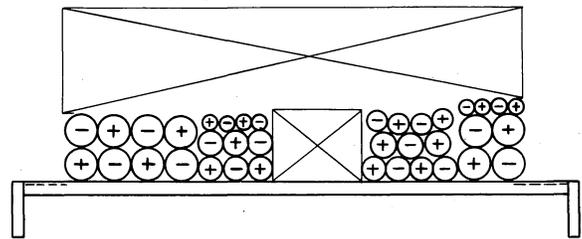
Power and Switchboard Cable on Cable Rack—Typical Section
